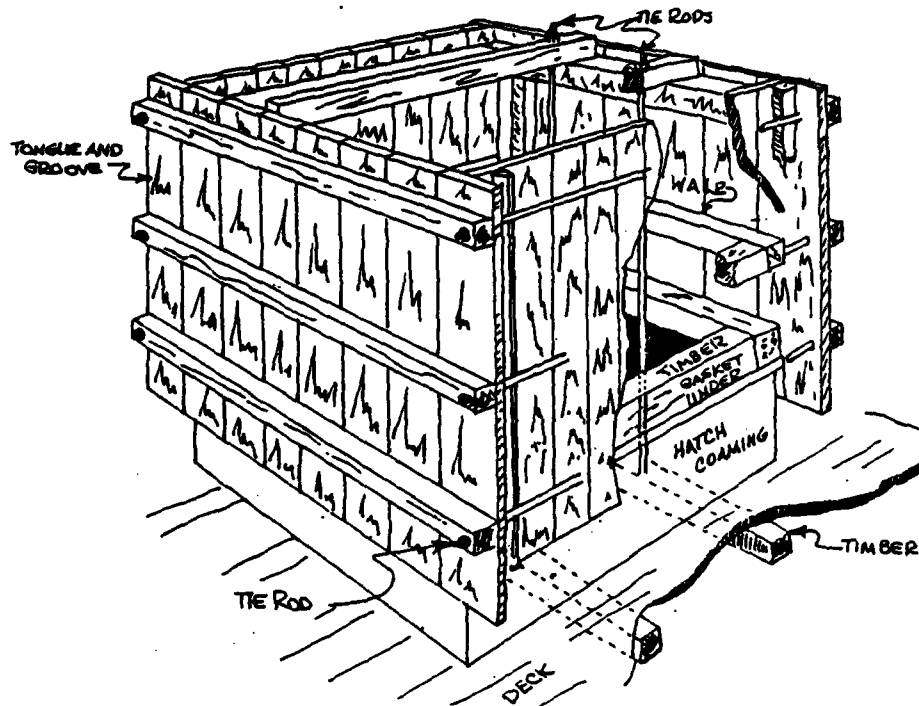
SAMPLE COFFERDAM CONSTRUCTION [13]
